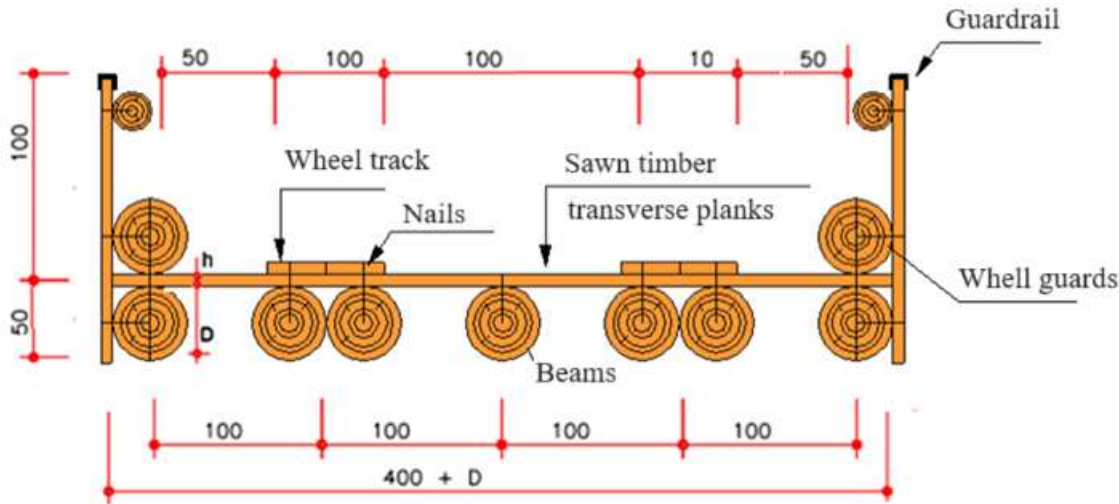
Cross-section of a deck of sawn planks with natural round beams [Units: cm].
